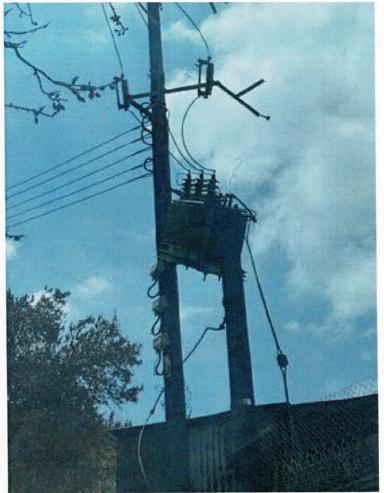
Example of fire damaged electrical infrastructure provided by EAC
